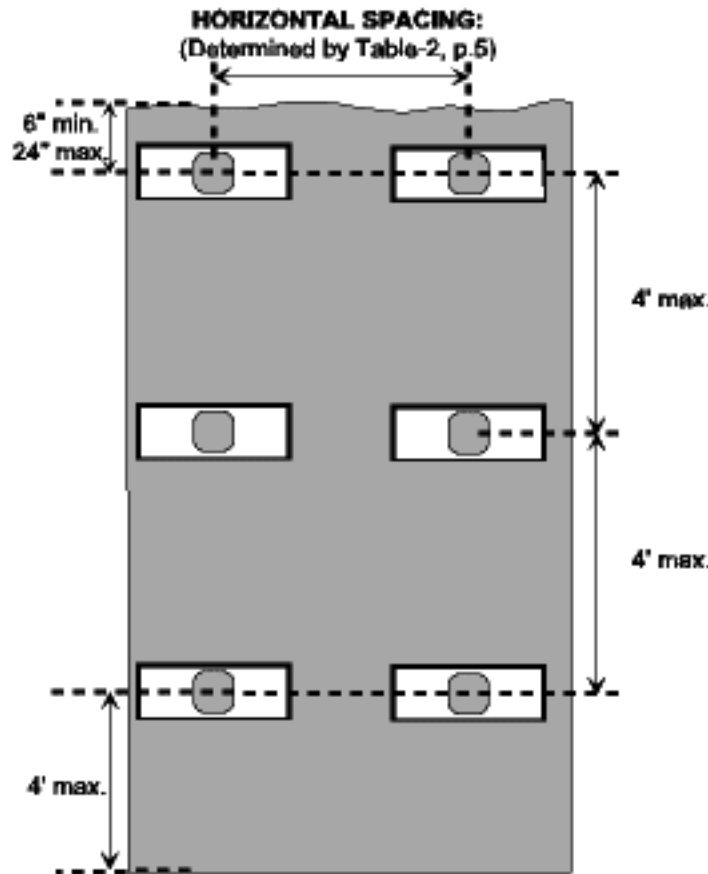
Allowable placement of wale plates in trenches where plywood sheeting is not required (horizontal orientation)
